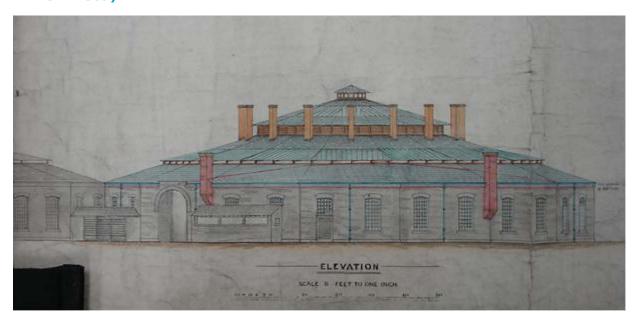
External elevation of RH1, with new roof c. 1890 designed by W. Bell (NA RAIL 527.590)
